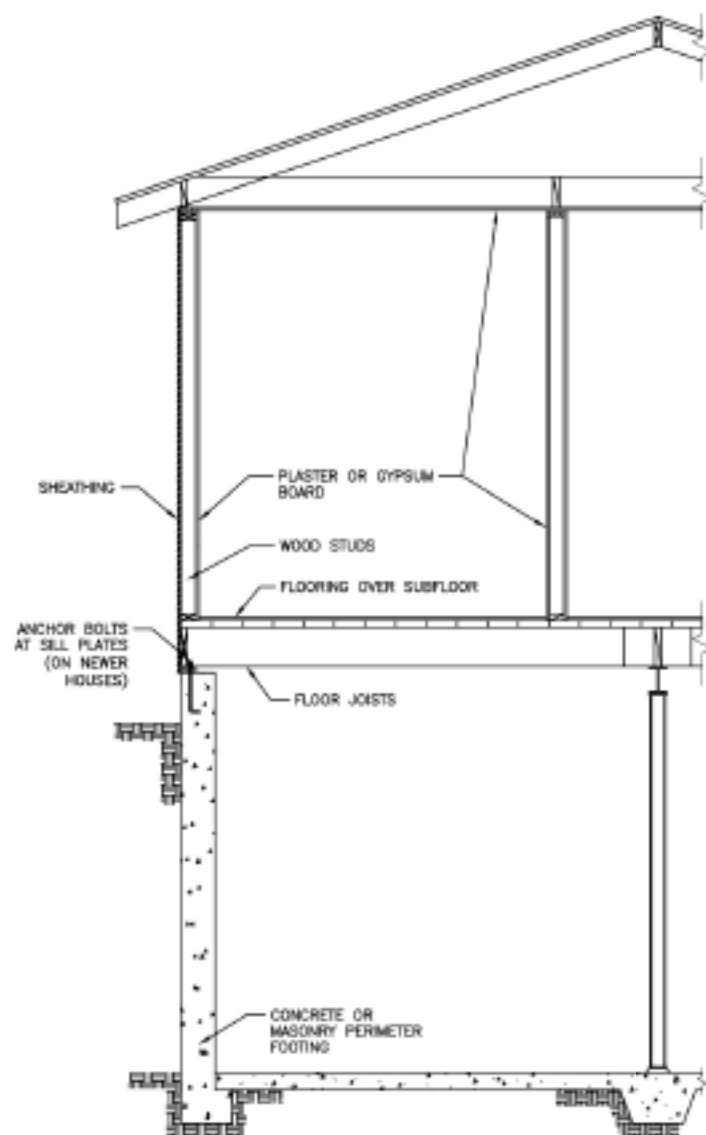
Section through a typical one-story basement house (from ATC, 2002).
